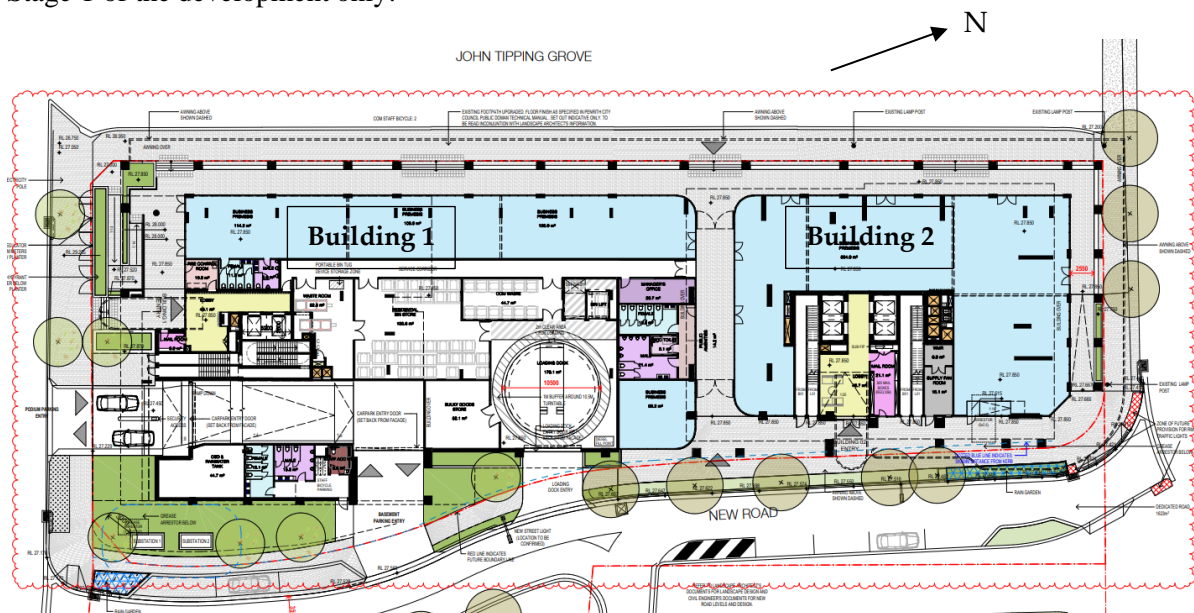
Ground floor plan of the proposed Stage 1 development (SJB architects, 2021)
